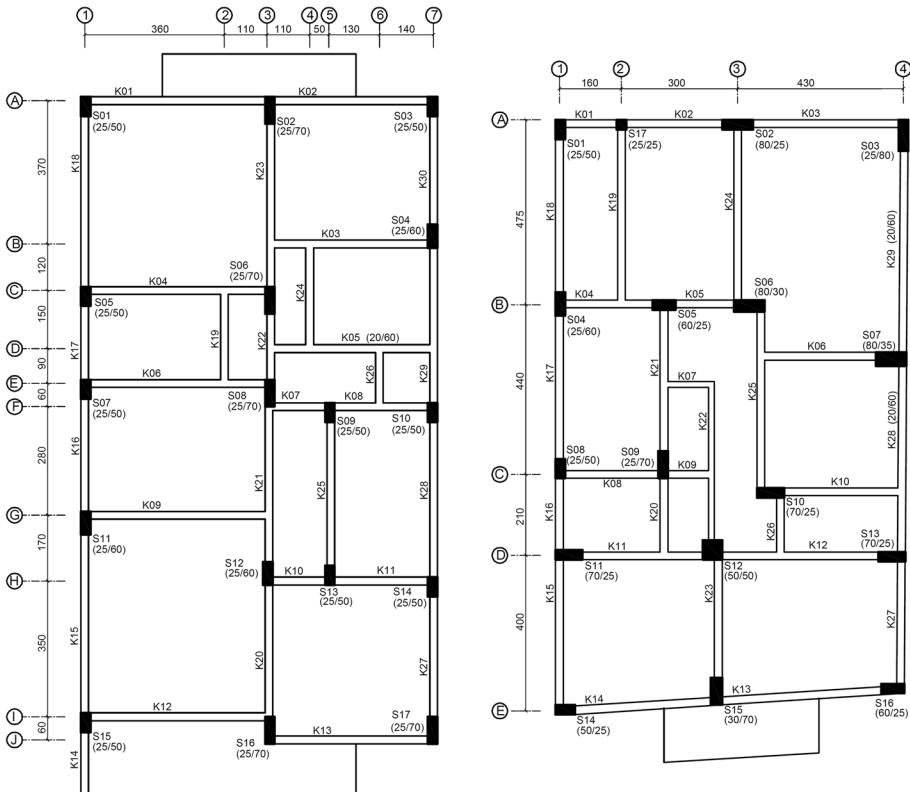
Floor plan for buildings 5A and 5C (units in cm)
